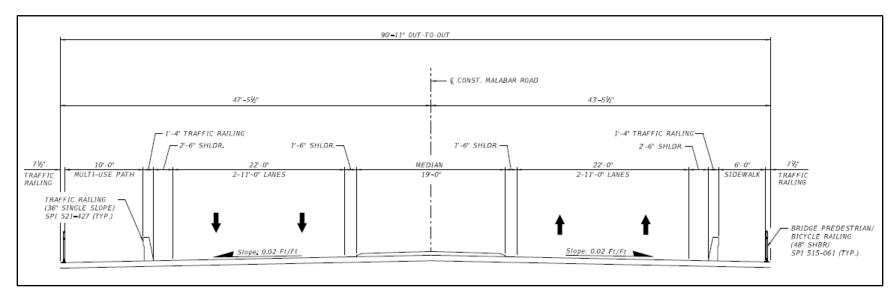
Canal C-10 Bridge – Alternative B Desired Right-of-Way and Flush Sidewalk
